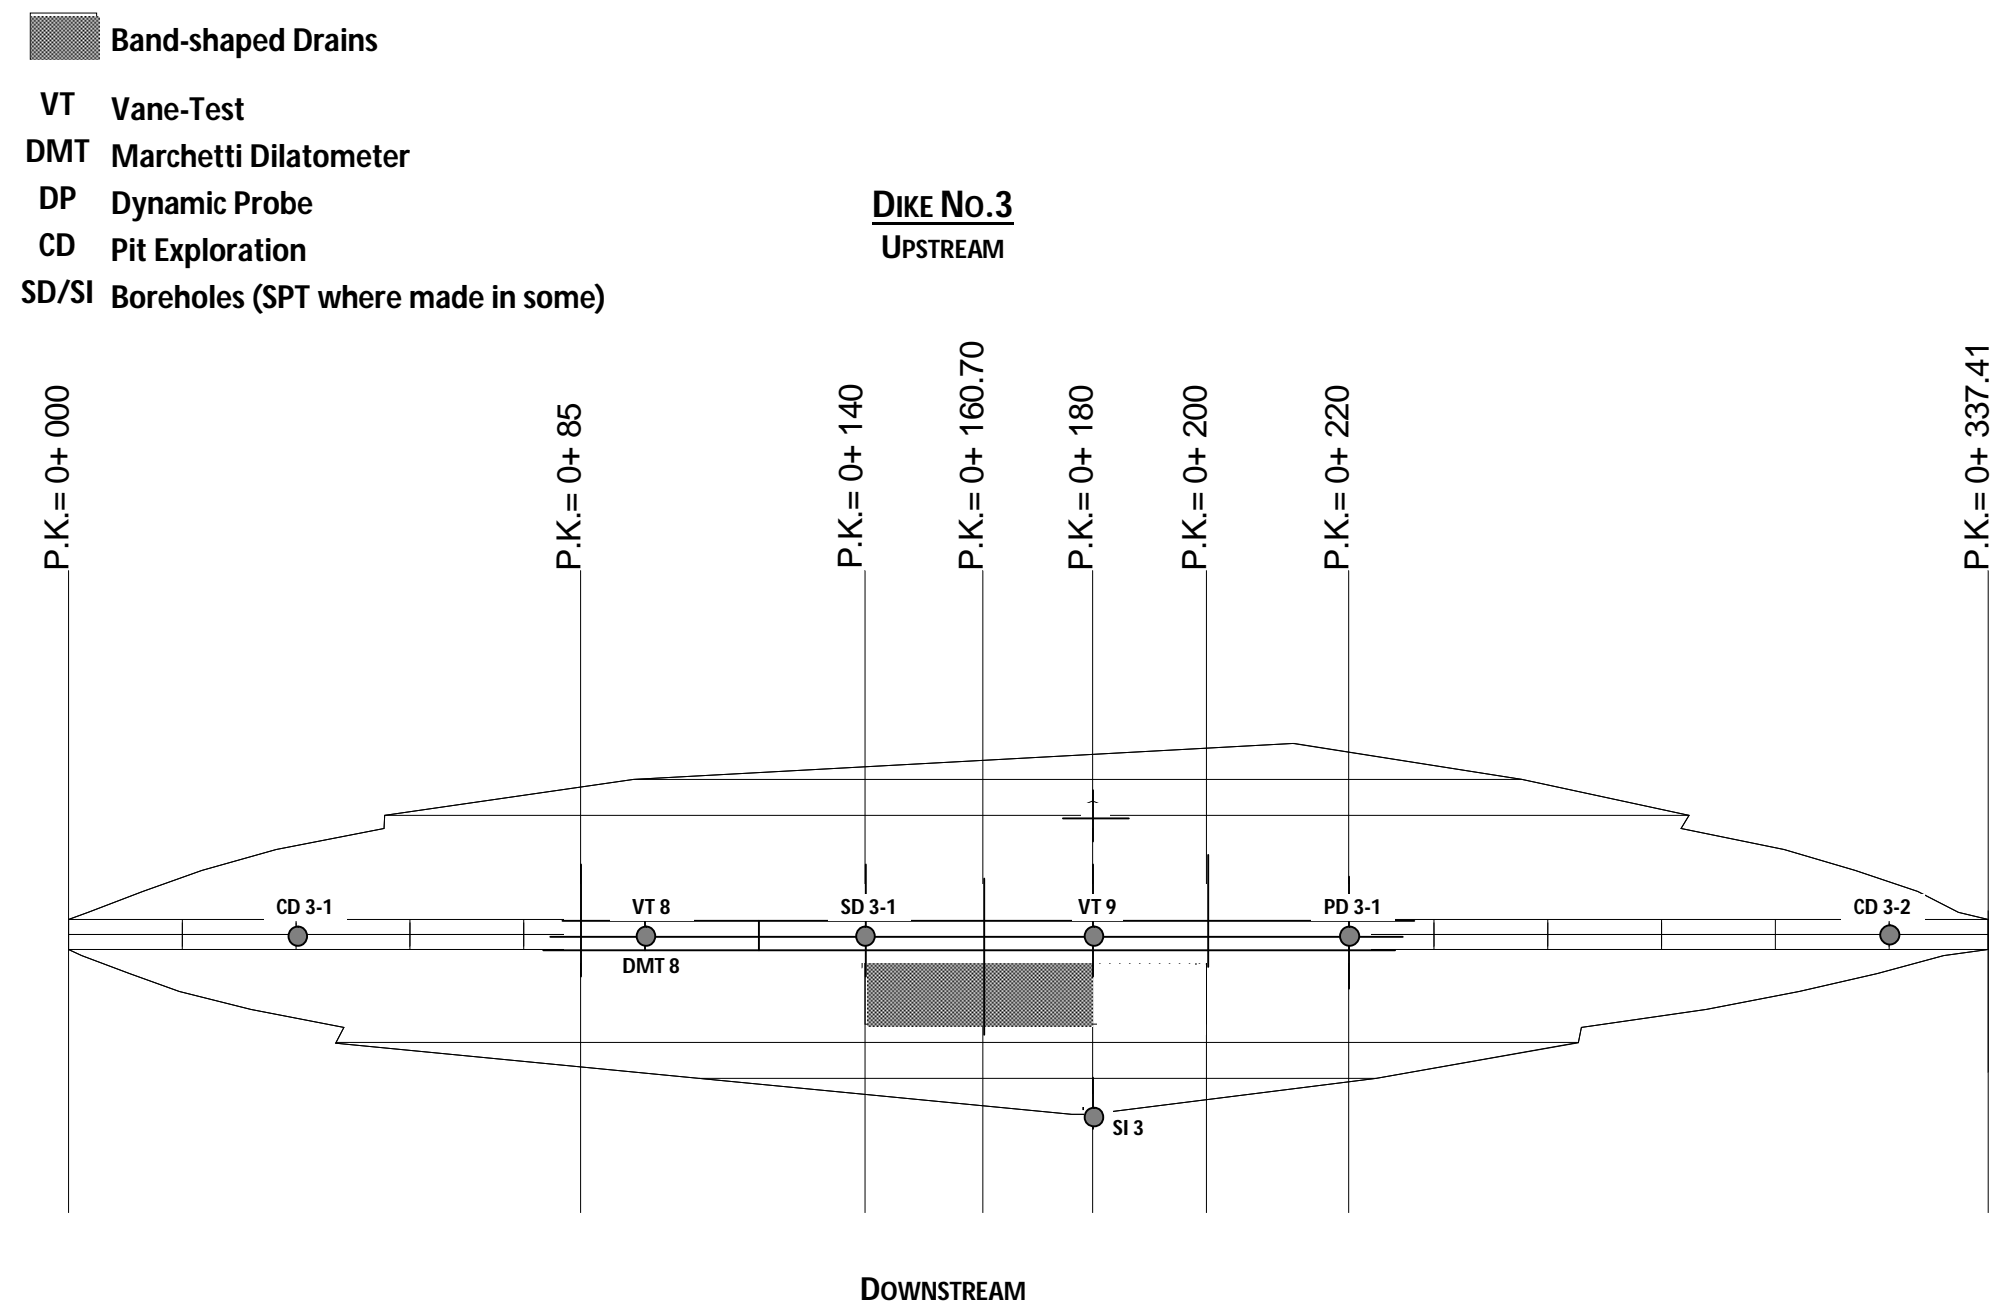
Plan showing the geotechnical prospecting made in Dike No.3.
